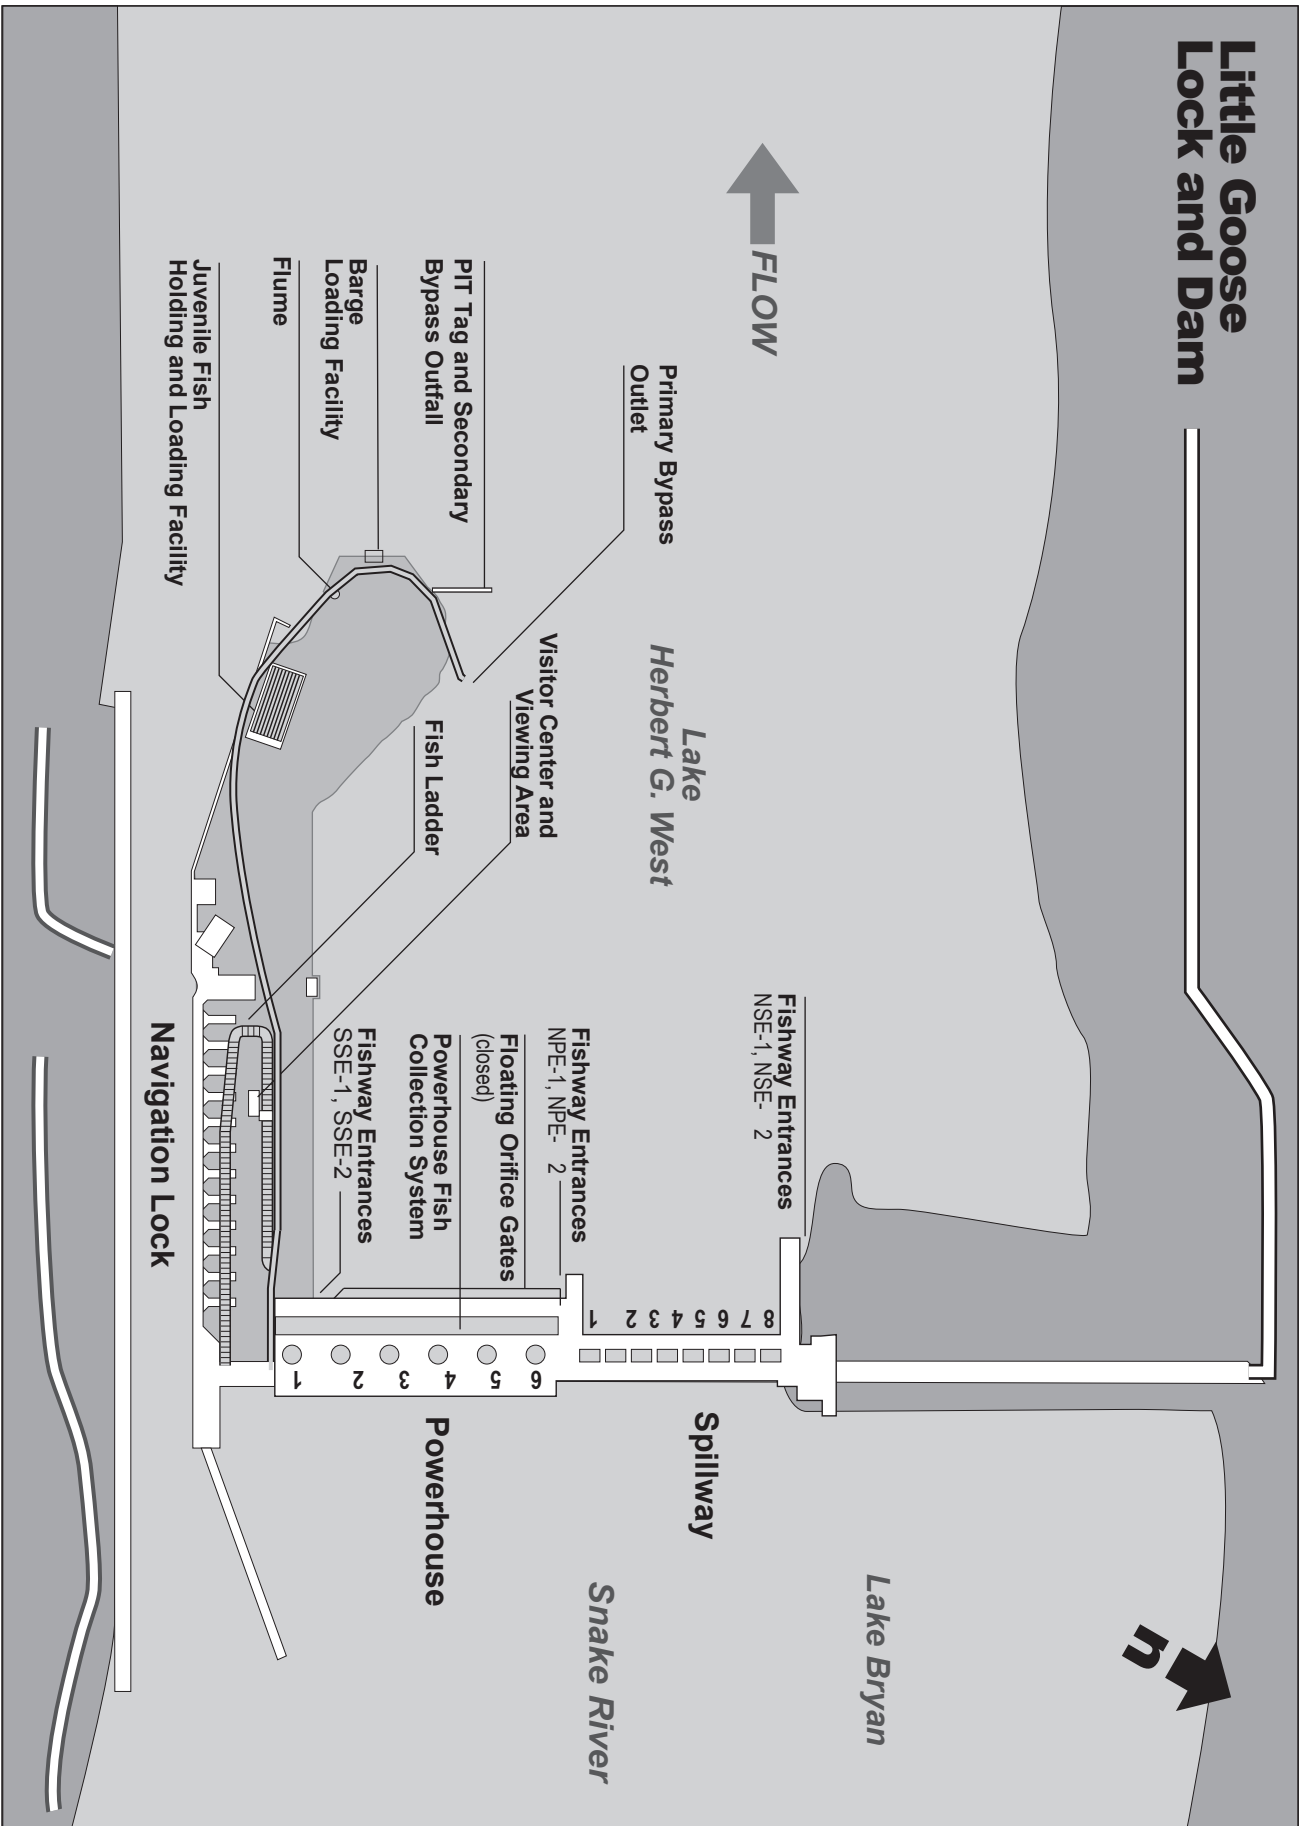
Little Goose Lock and Dam General Site Plan
